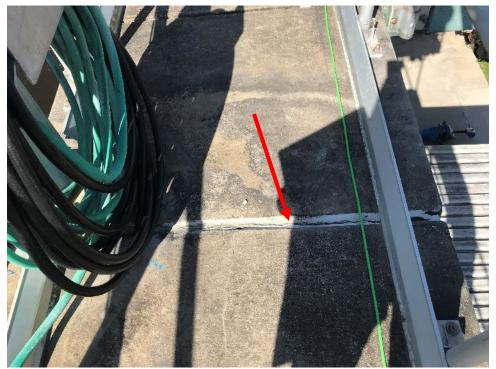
View of typical cracking on walls at SBR Basin.
